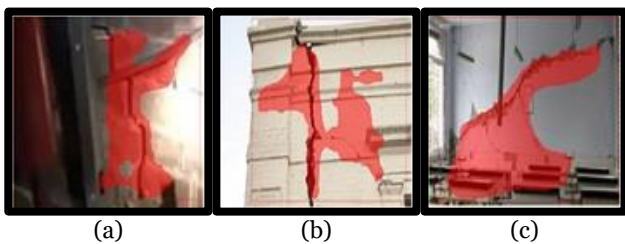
Crack identifications in the real world scenarios such as (a) Cracks at the sewage pipes, (b) Cracks on external structures, (c) Cracks on the wall
